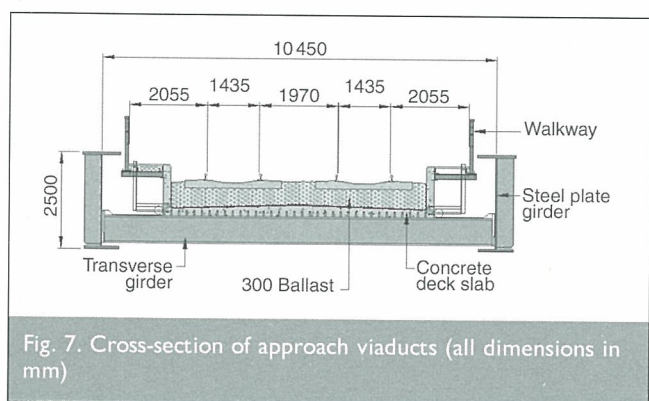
Cross-section of approach viaducts (all dimensions in mm)
